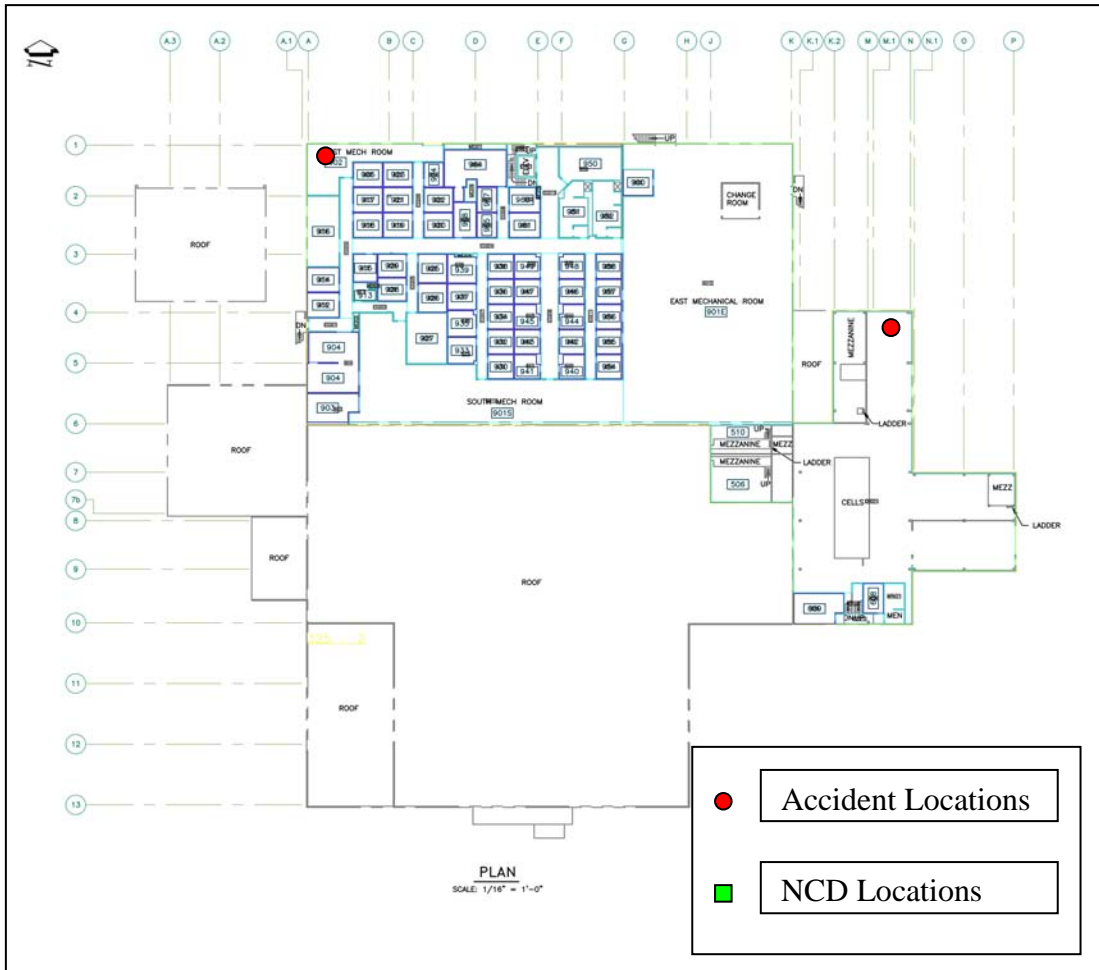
RPL Second Floor showing accident locations, no NCD are located on this floor
